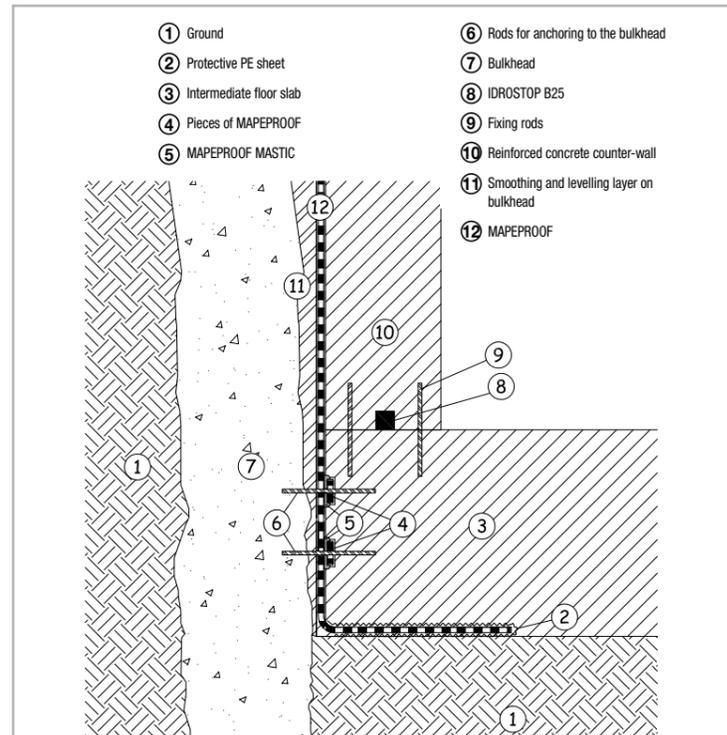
Detailed layout of waterproofing the end of an intermediate floor slab in a top-down construction
